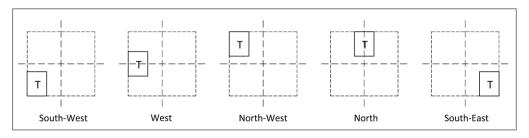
Location of terraces in relation to the layout of the ground floor
